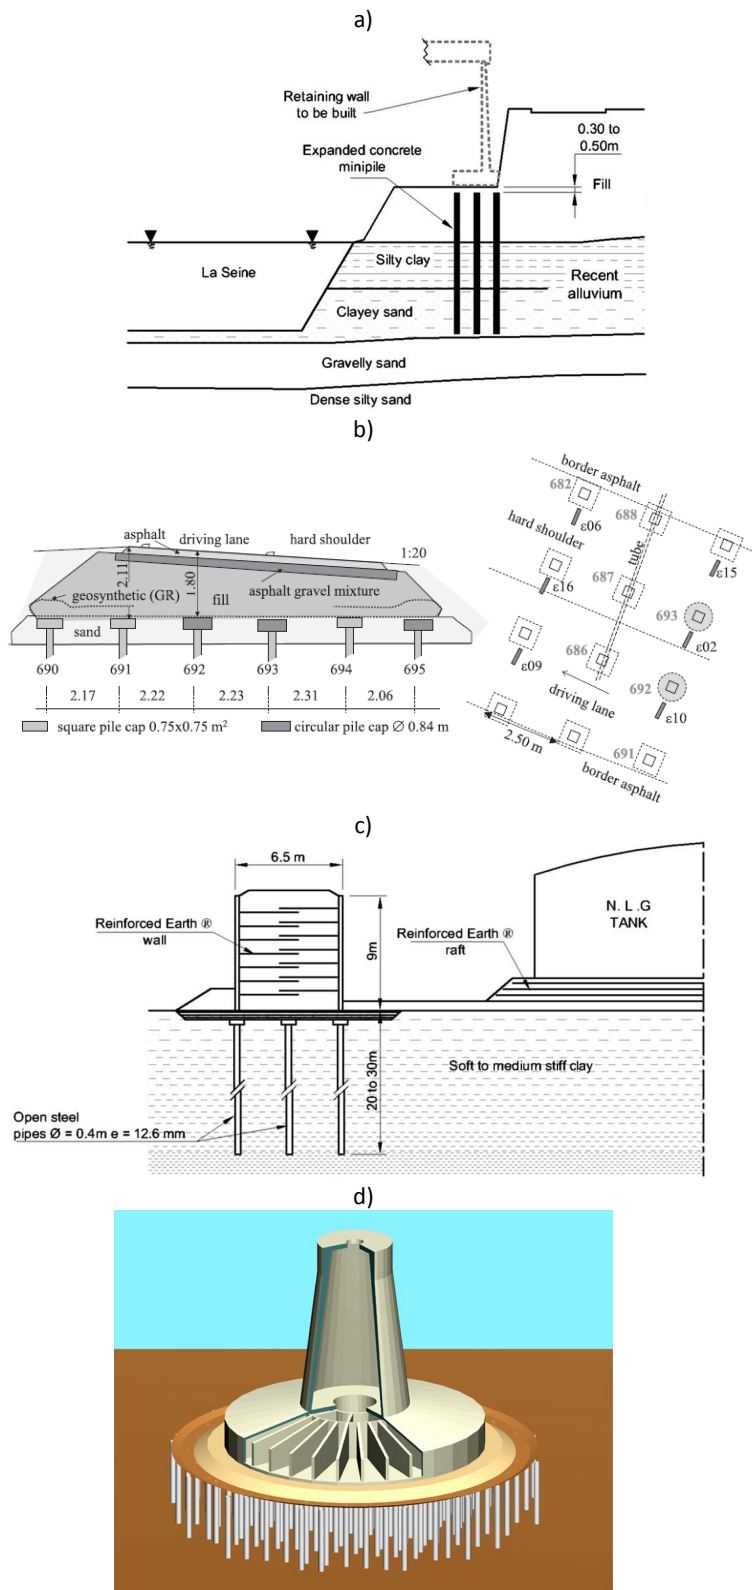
Several applications of piled embankment method for infrastructure projects: a) Retaining wall foundation at Clichy; b) Reconstruction of the highway's exit near Woerden; c) Bontang earth reinforced protection dykes; d) Rion - Antirion bridge pier, Greece in Combault et al. (2000); Simon and Scholsser (2006); van Eekelen et al. (2015)
